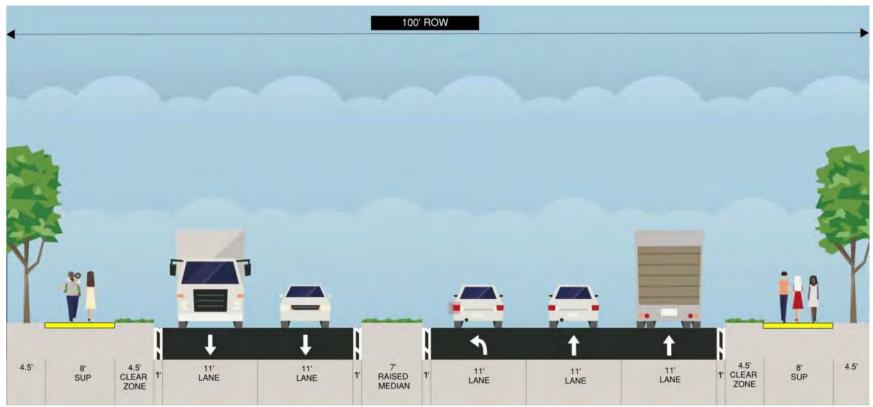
B: Proposed Typical Section with Left Turn – Memorial Drive (Tallowood Road to Frostwood Drive)
